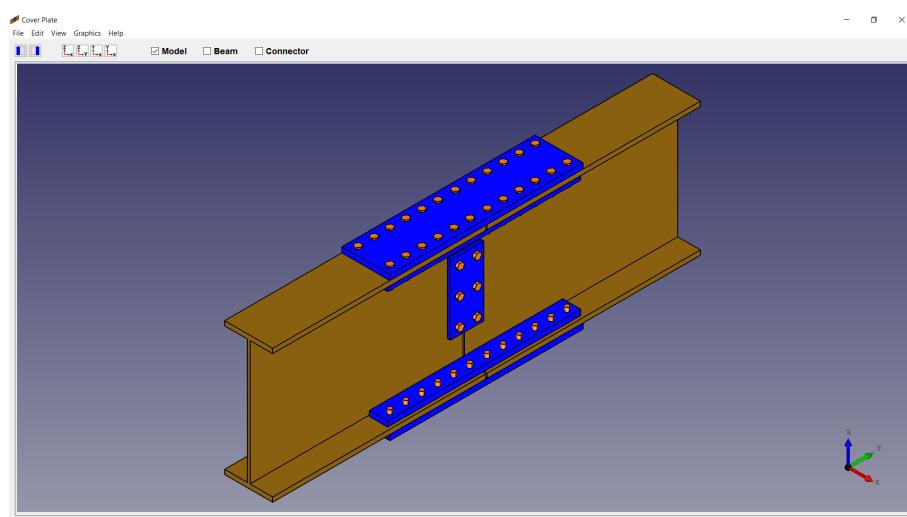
3D drawing output of typical Beam to Beam Cover plate connection
